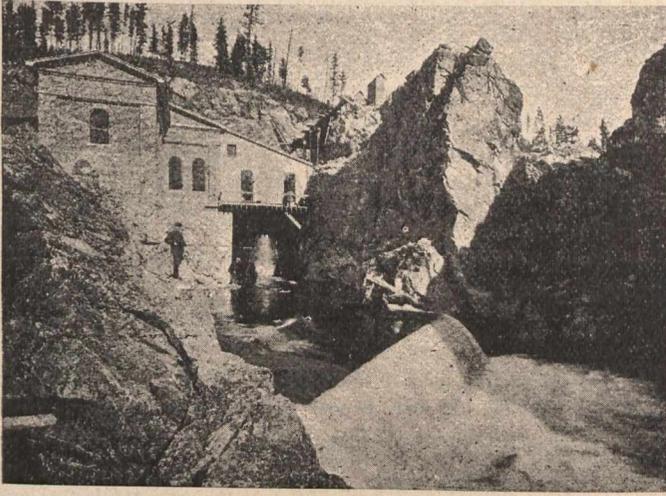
Rear View of Power House Showing Draught-Tube and Tail Race.
